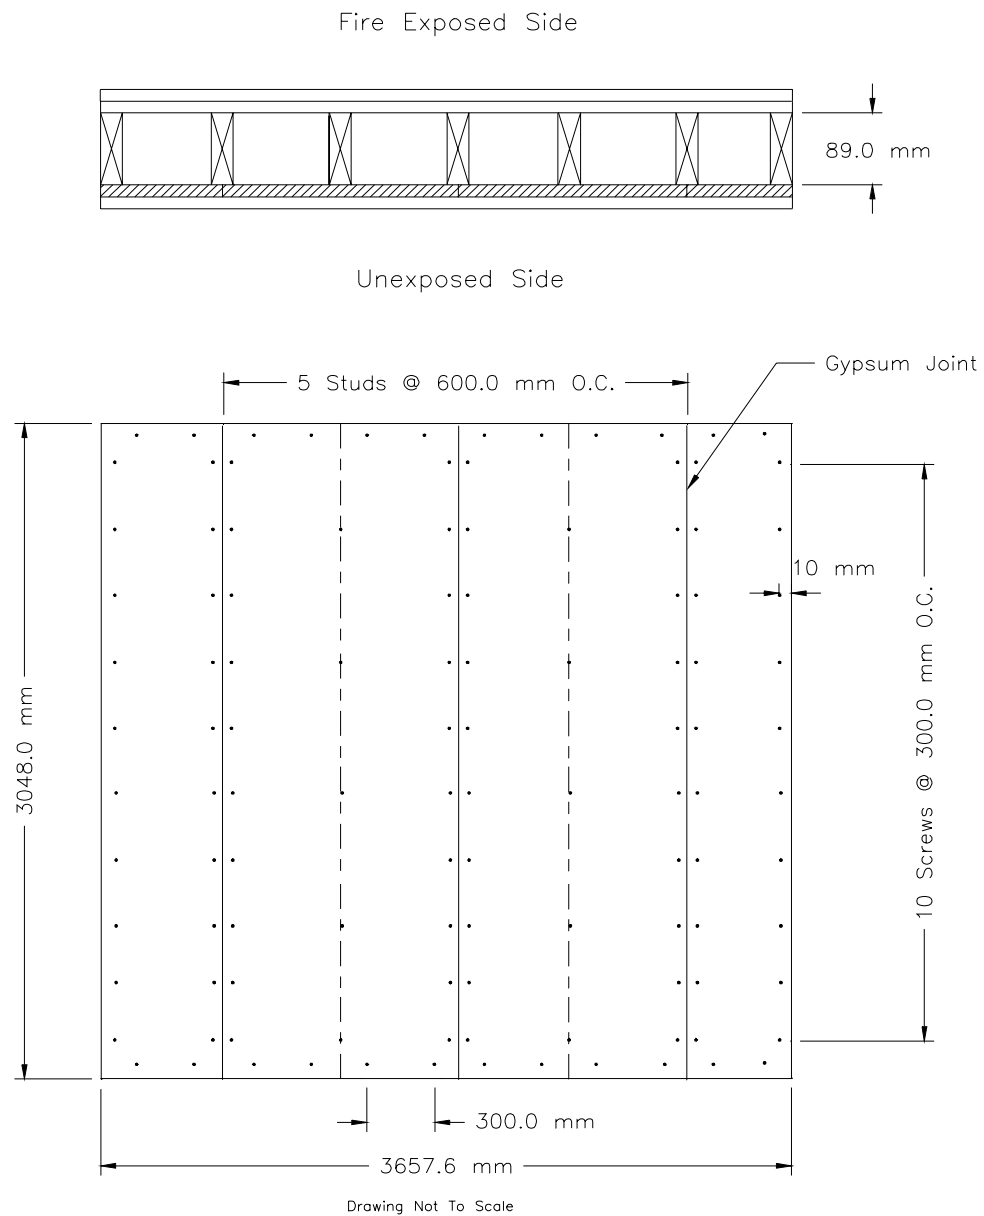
Screw Locations For Wood Stud (600 mm O.C.), 2x2 Gypsum Board Layers, Full-Scale Assembly (Base Layer, Unexposed Side)
